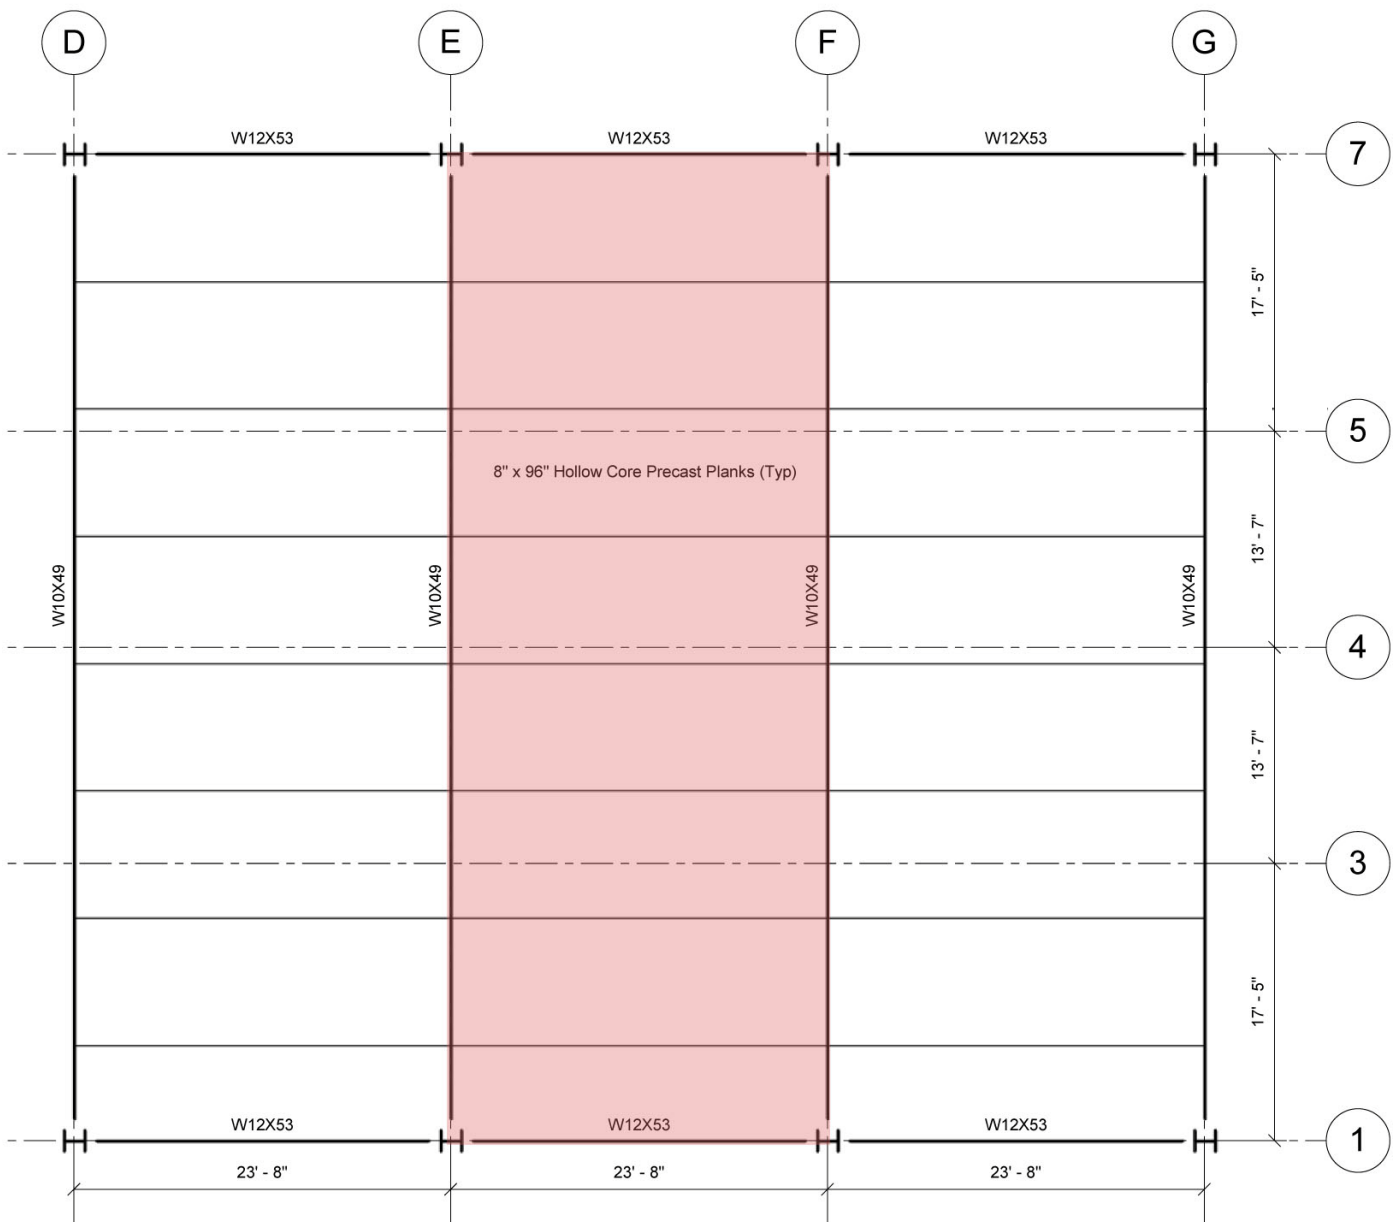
Typical Framing Plan, Highlighted Bay will be Analyzed for Alternative Floor Systems
